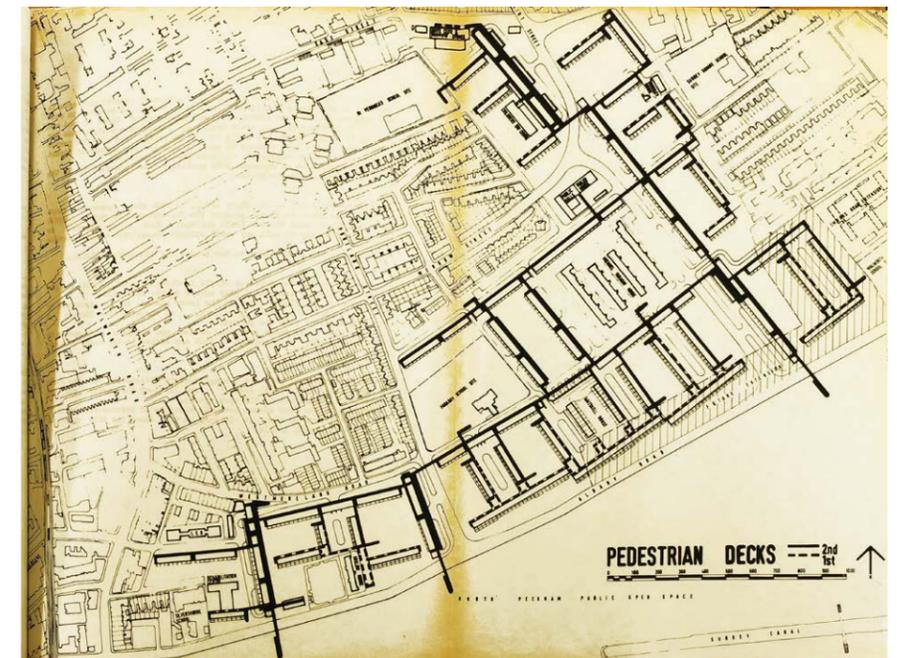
Aylesbury Estate Plan, 1971, Southwark Archives
